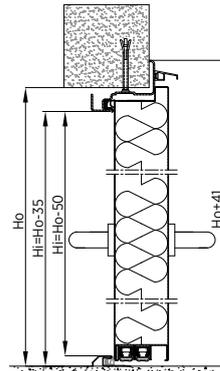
Installation of the ECO Tech single-leaf seamless door with a corner frame without a thermal break to a masonry wall - vertical cross-section
